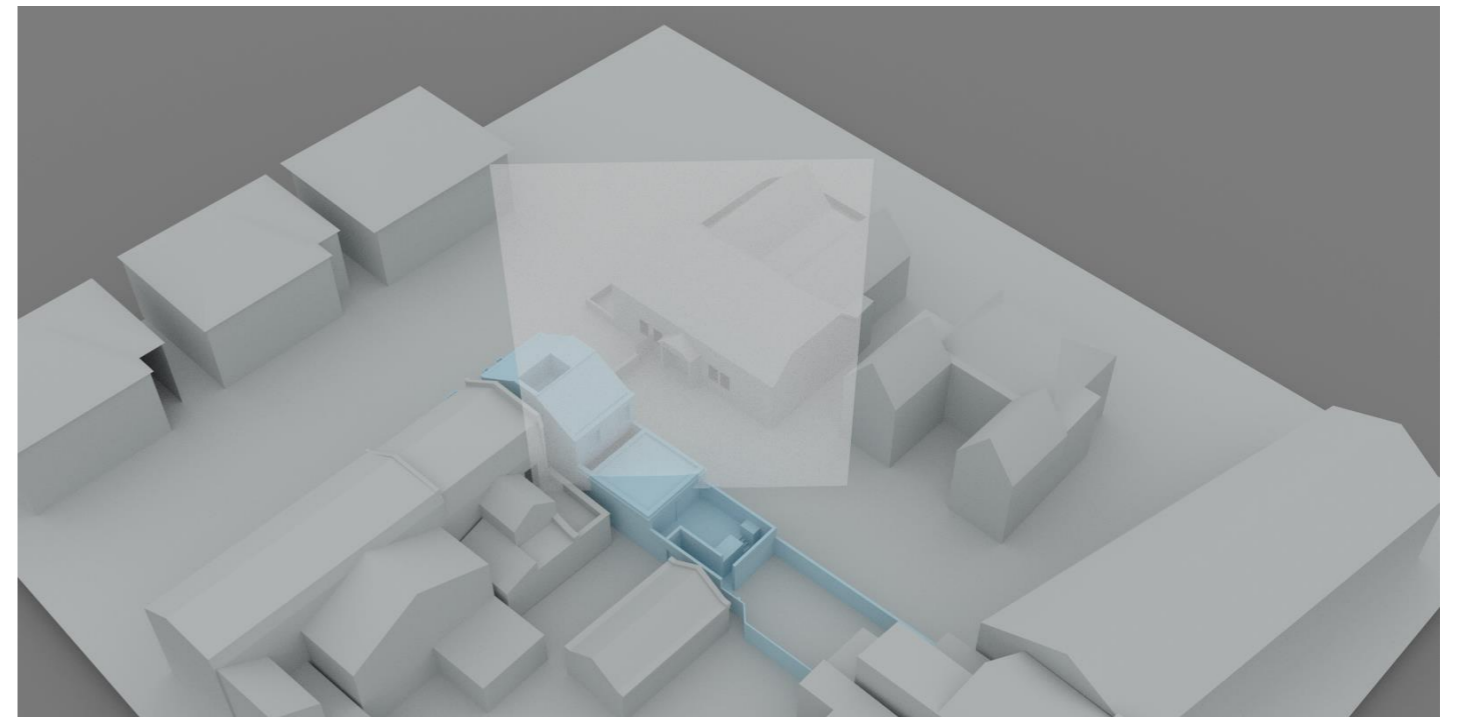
45-degree test met by first floor window at 5 Ellison Road.
